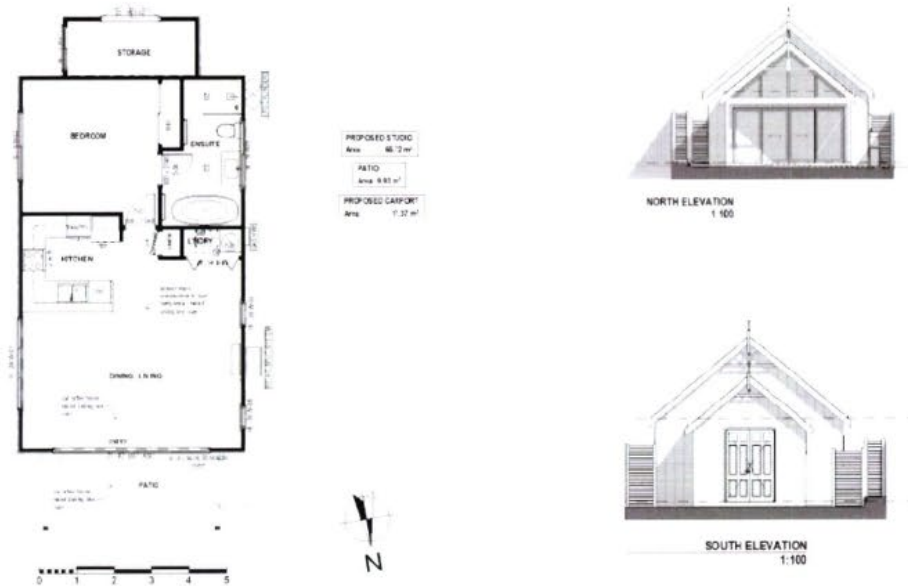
FLOOR PLAN AND ELEVATION OF THE PROPOSED STUDIO.
